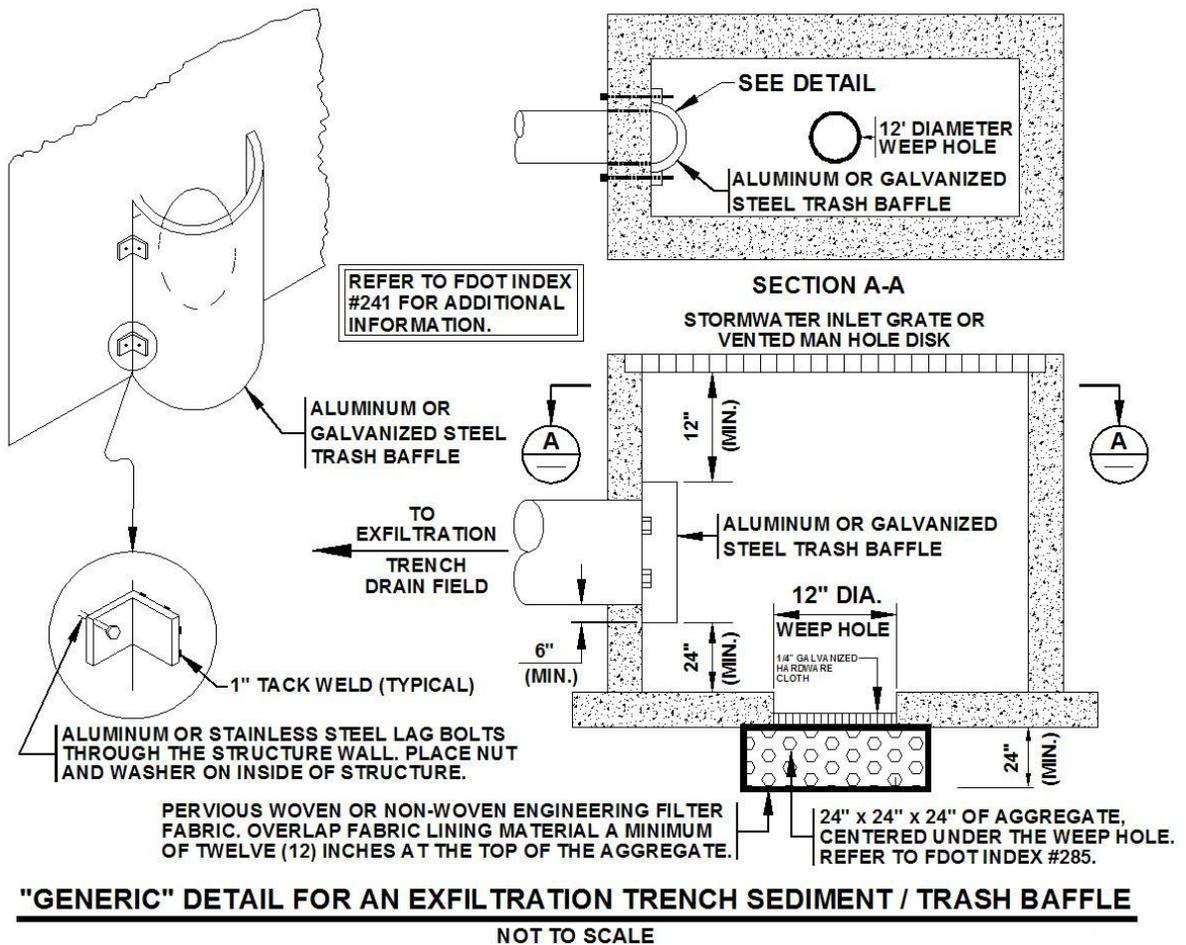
Detail for Exfiltration Trench Trash Baffle
